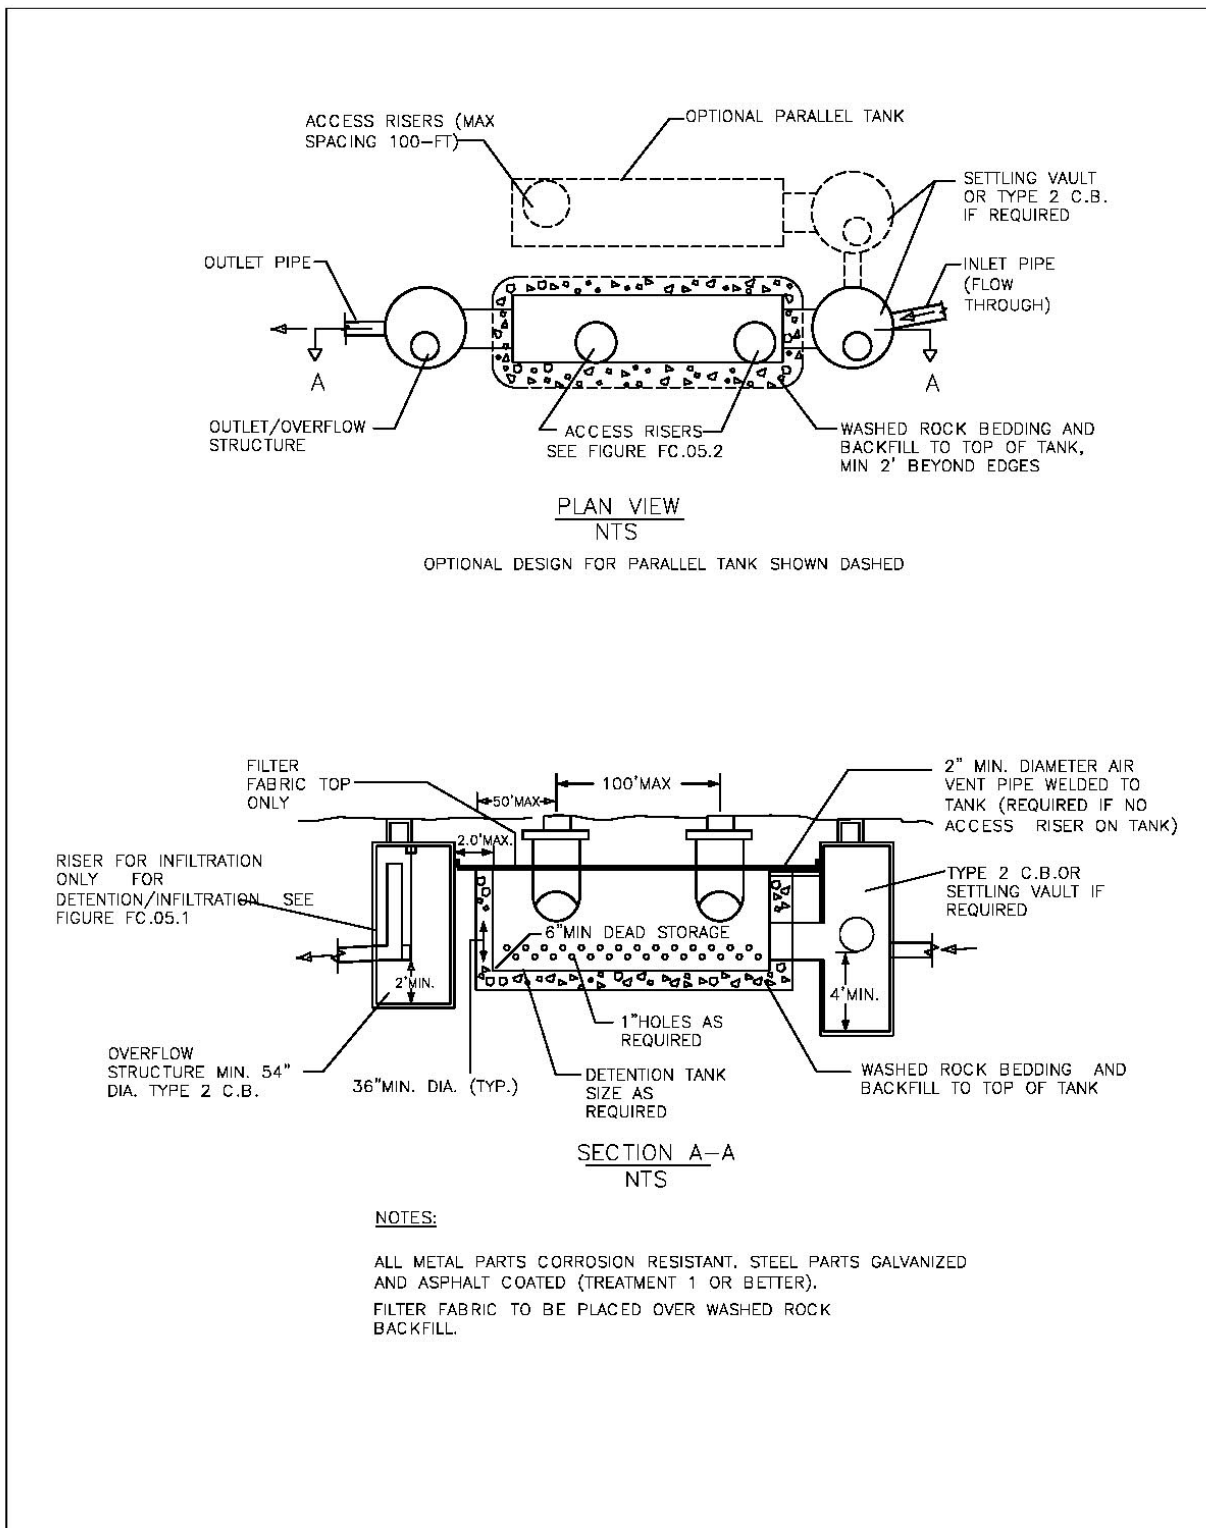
Infiltration vault constructed with corrugated pipe.
